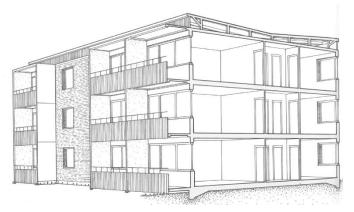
The common book stack structure with short side load bearing walls and infill walls between transverse load bearing interior walls on the long sides (Source: (Björk, Kallstenius & Reppen 1983)).
